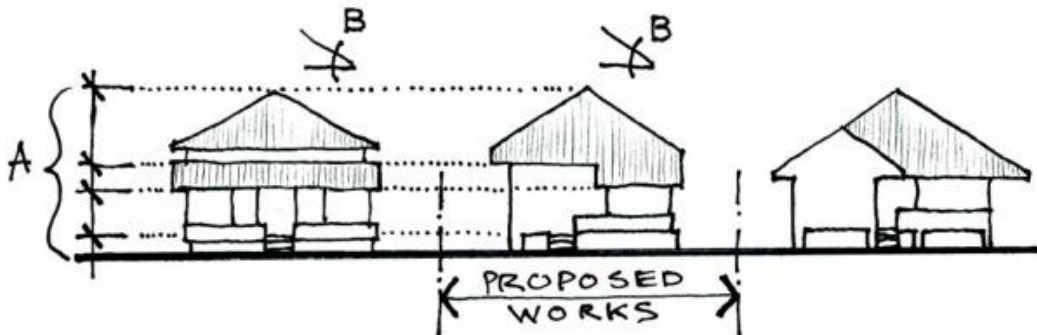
Illustrates an example of clear elevations of the proposed works and adjoining contributing character buildings, with references made to key elements
